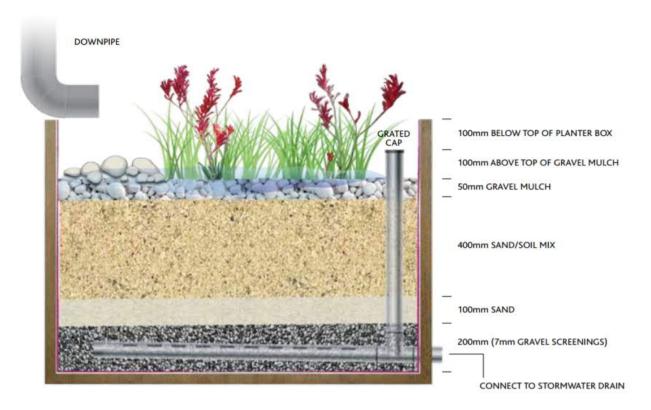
Example cross-sectional view of proposed planter box raingardens (Source: Melbourne Water²)
